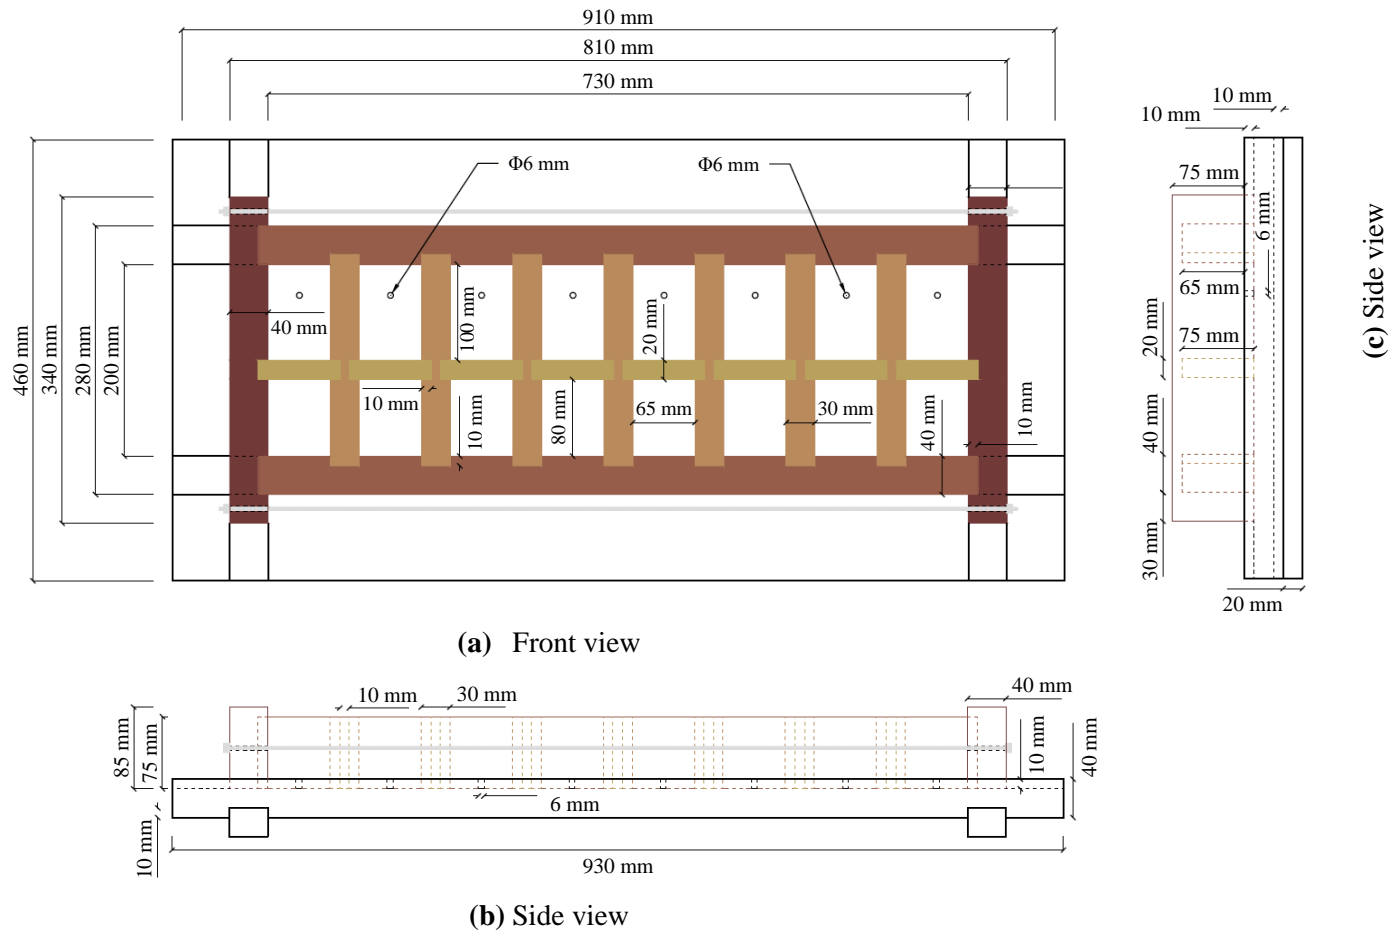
30. Dimensions of the mould designed for double-sided pullout specimens.
